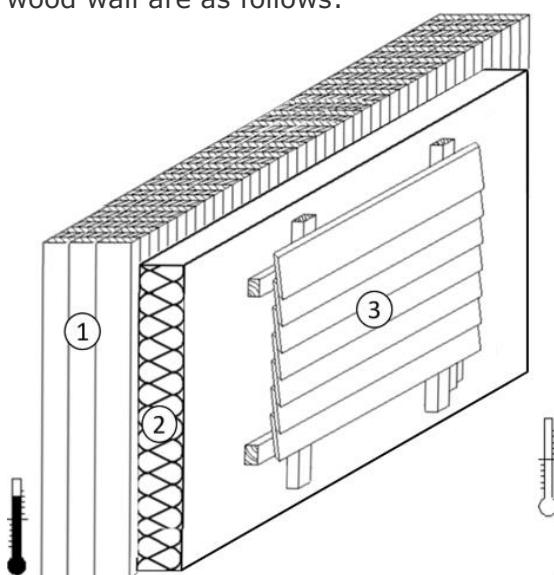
Layered structure of variant 1 – Solid wood wall [LEGEPE]
